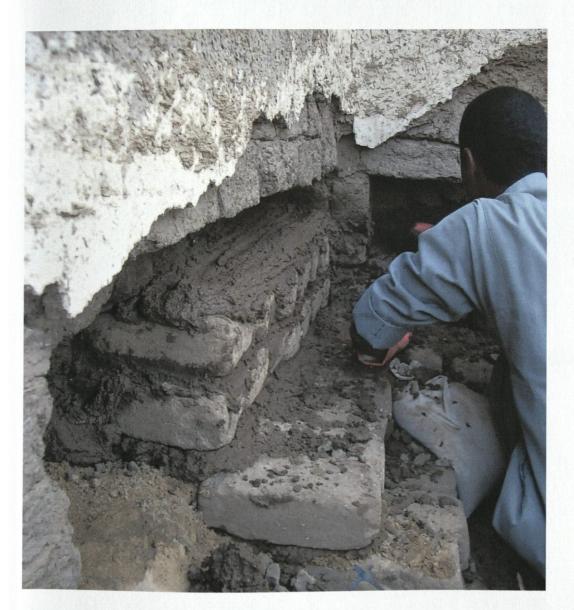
Mud brick masonry is being stepped back to the original wall face.
